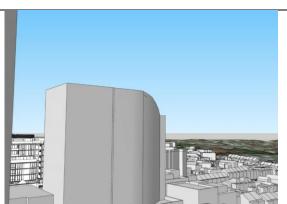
View towards subject site (to the far left) from RL115.75 eye level standing at mid tower level of Eastgate West Tower (west) showing modified envelope (source: applicant's submission)
